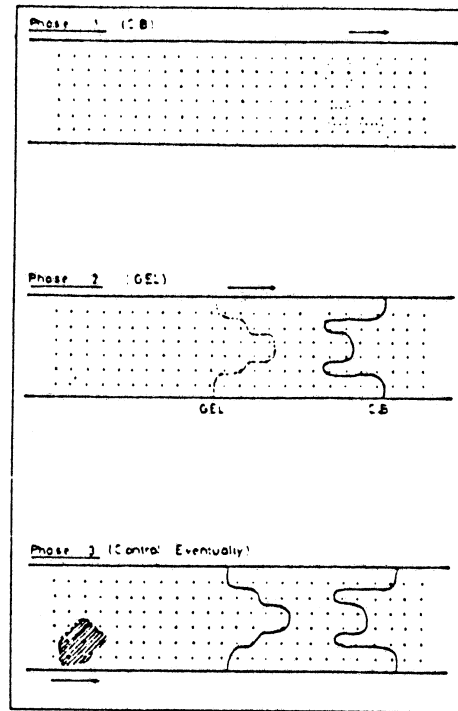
Details of Grouting Sequence, Cairo Metro (Abdel Salam, 1984).
